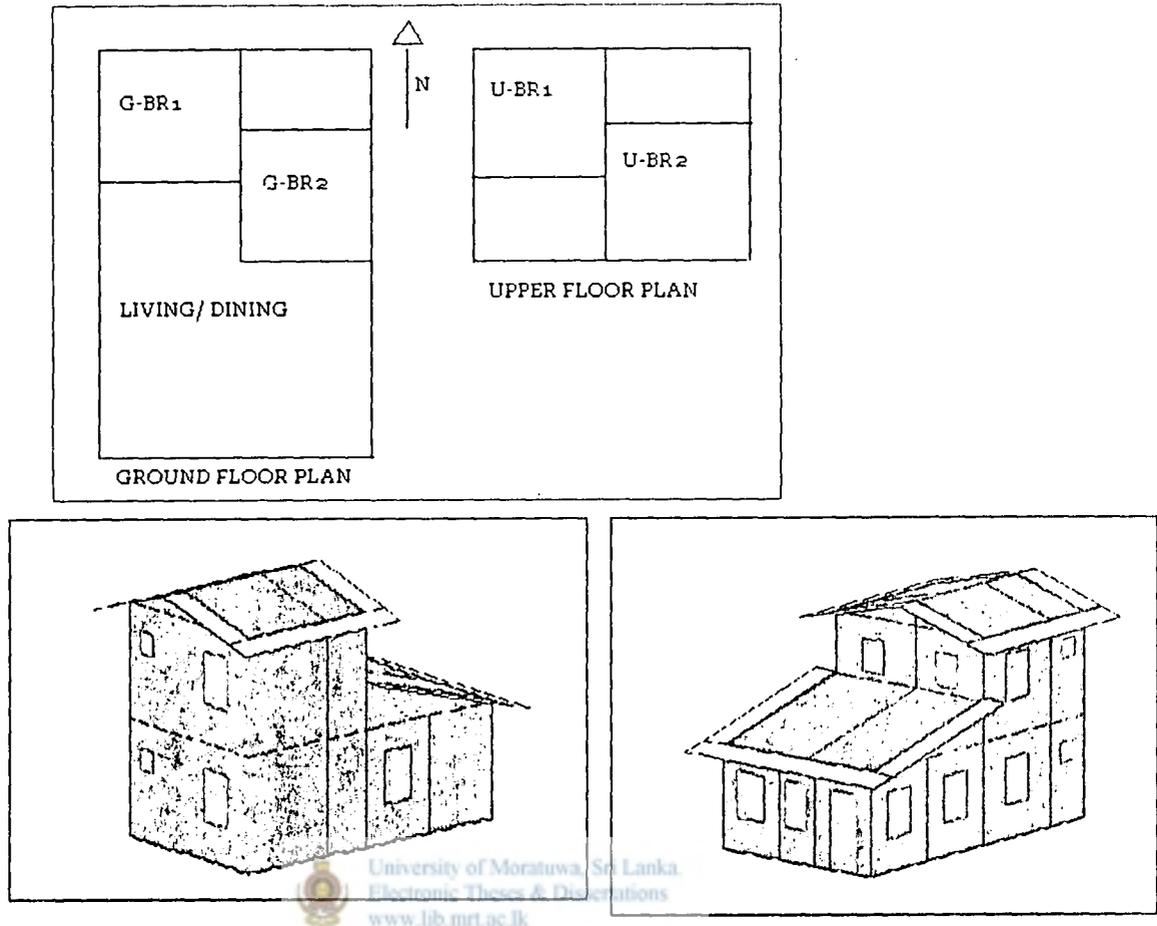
The plan arrangements used for the ground and upper floors and the corresponding 3D view.
